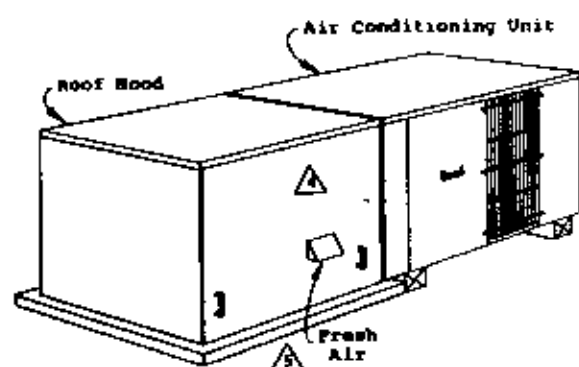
TYPICAL ROOFTOP INSTALLATION
